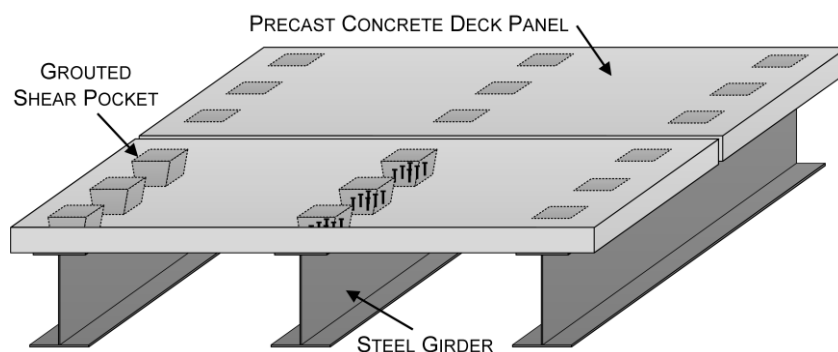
Precast bridge deck on girders with welded stud groups.
